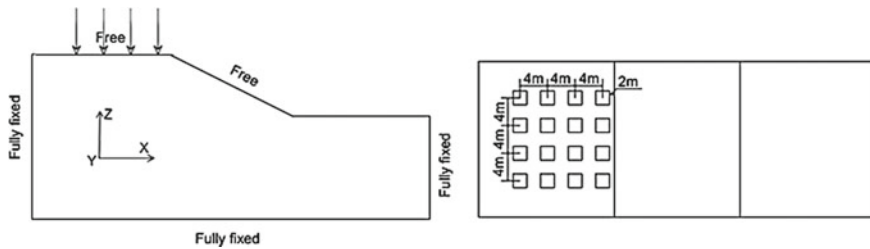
Geometry of the problem statement in elevation and plan with boundary fixities
